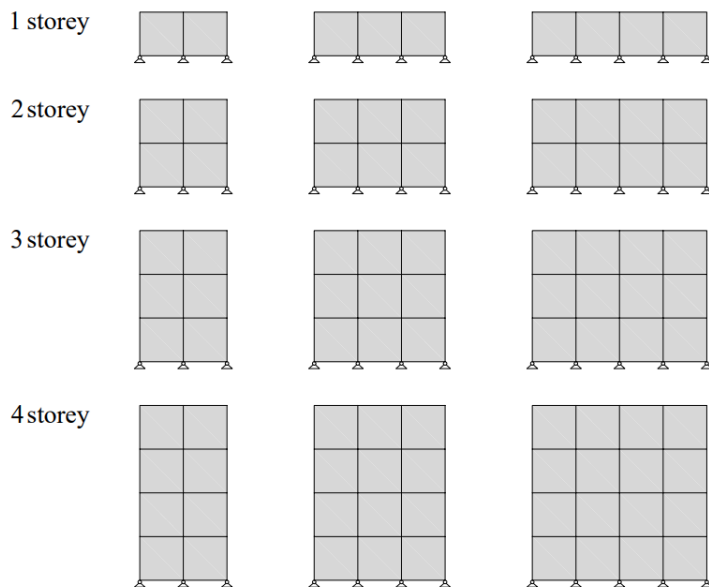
Configurations of panels for the models of multi-storey buildings.
